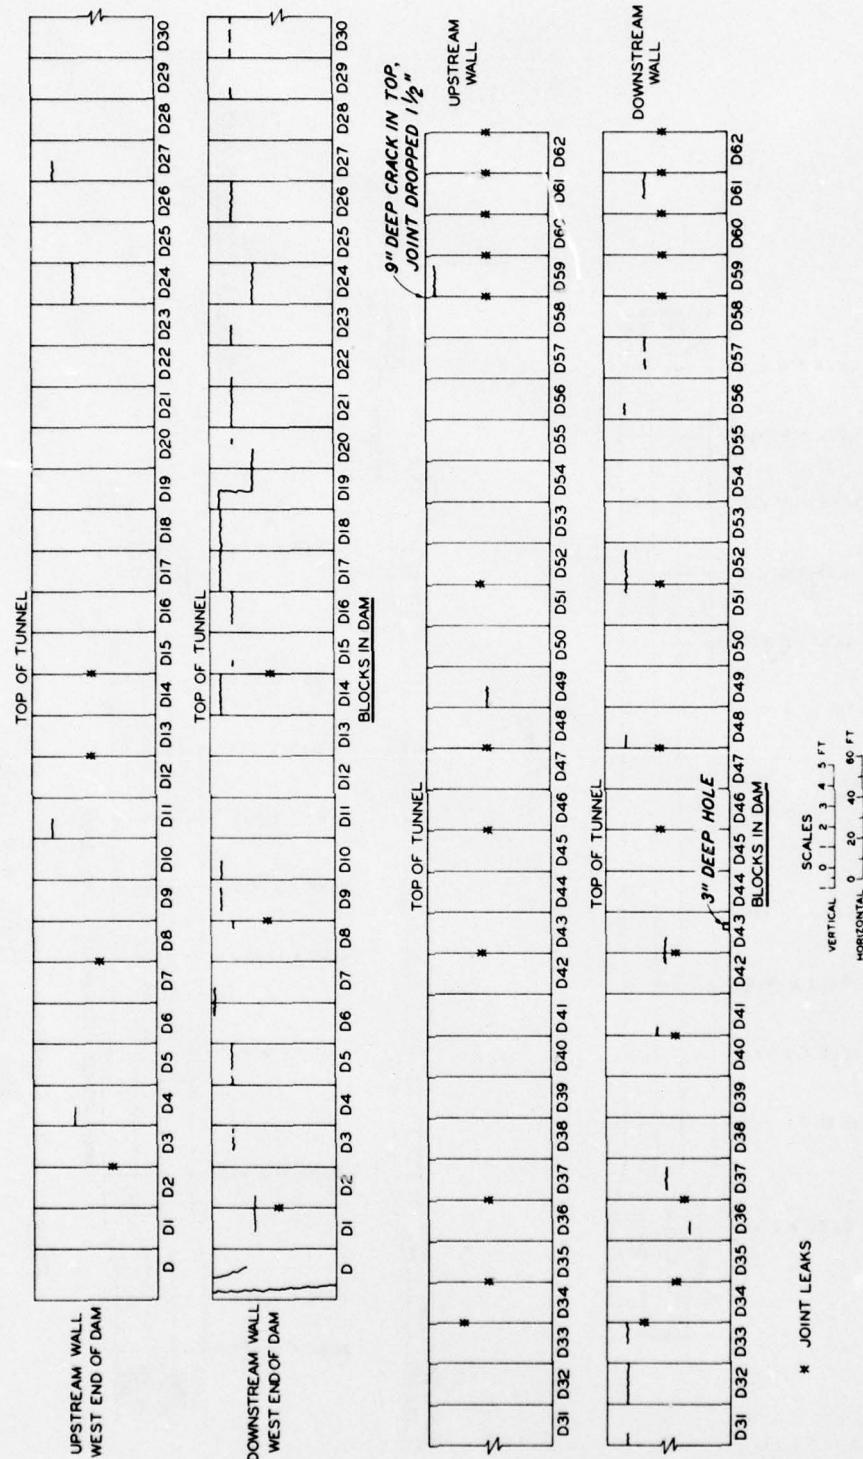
Cracks and leaking joints in tunnel of dam,
